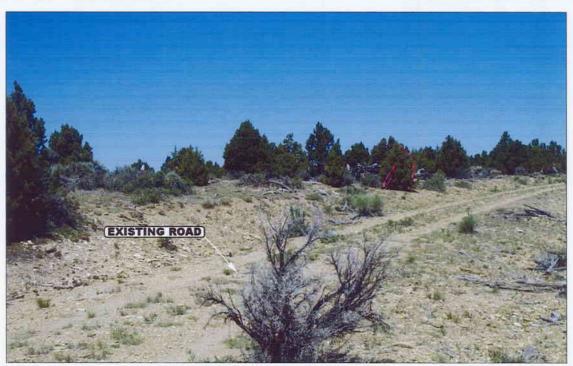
PHOTO: VIEW OF EXISTING ROAD TO UPGRADE
